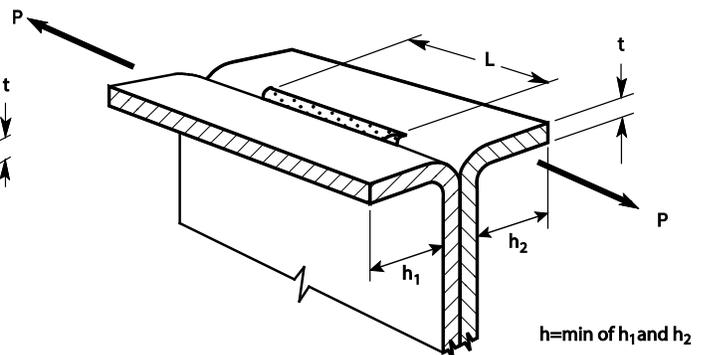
Shear in Flare V-Groove Weld
